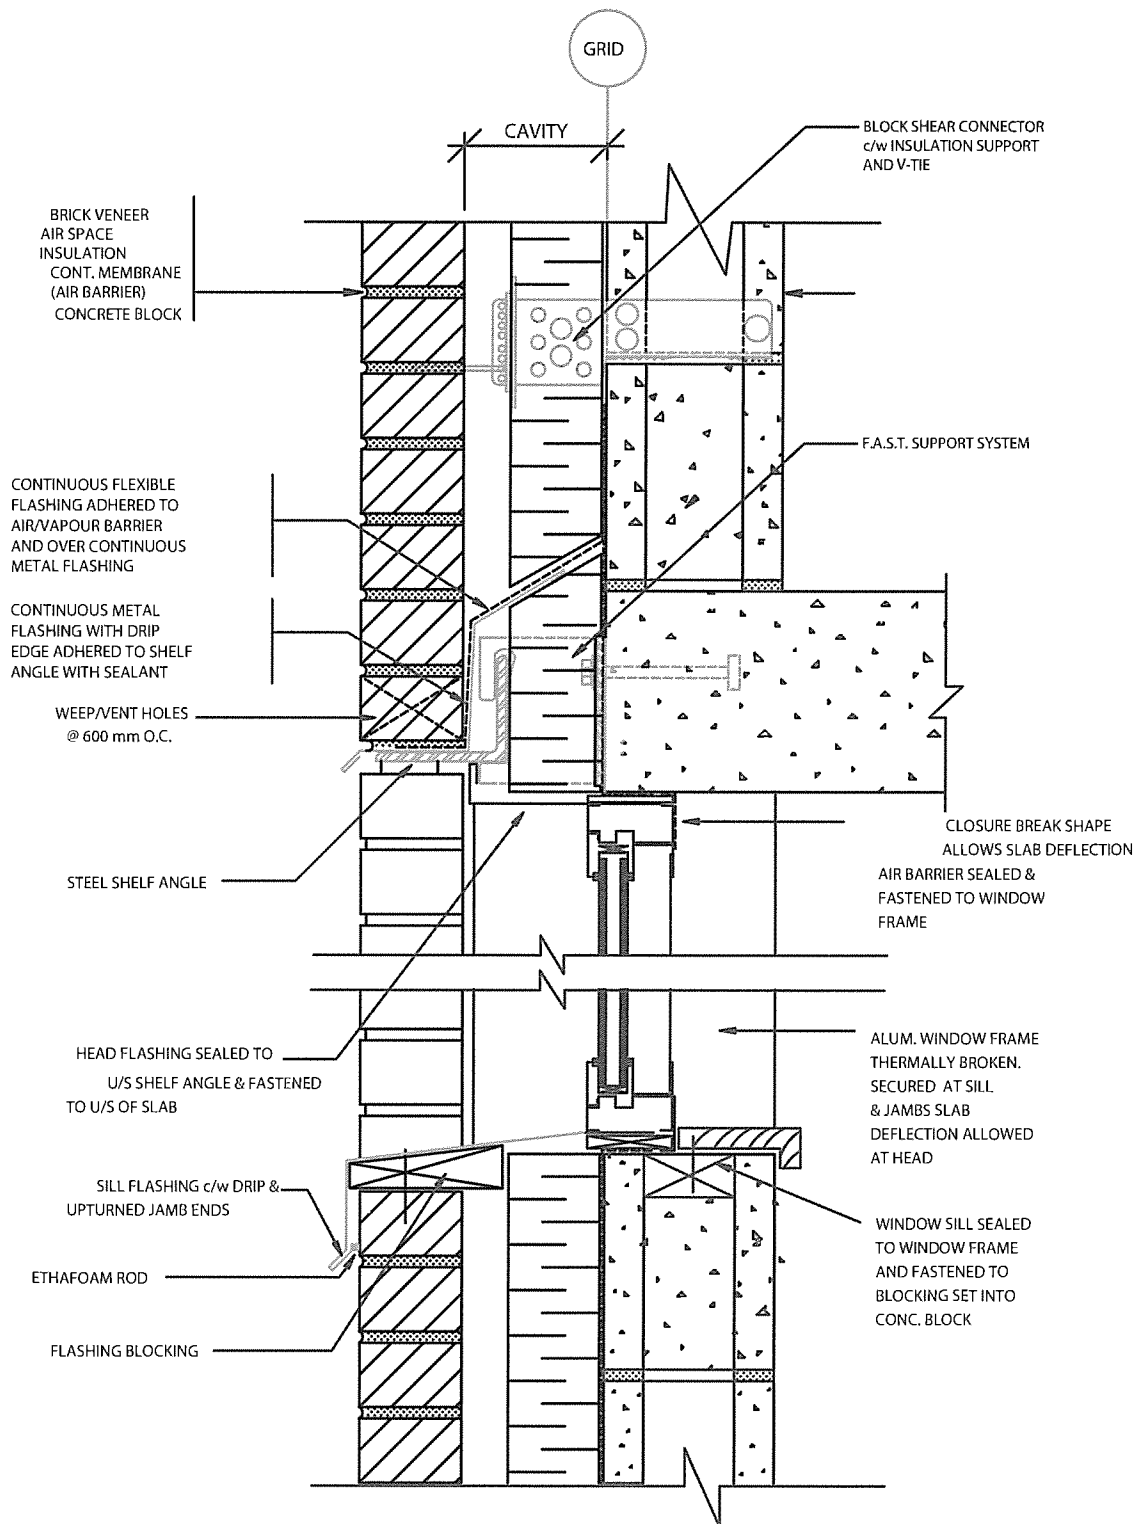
BRICK VENEER / CONCRETE BLOCK - WINDOW HEAD & SILL DETAIL
